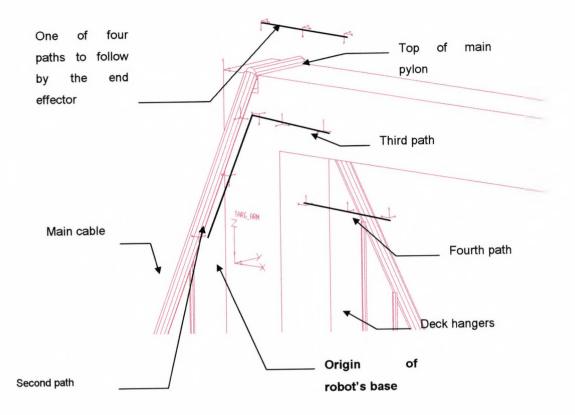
Bridge Detail [E1] according to Table 4.3
